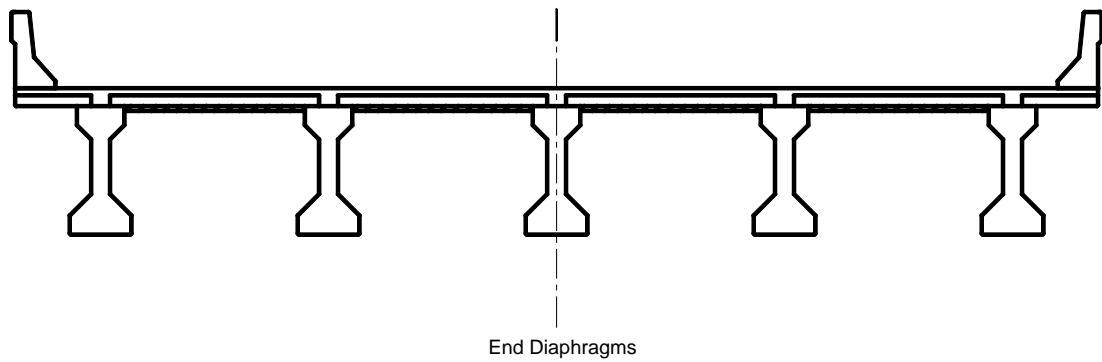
Diaphragm Layout – Willis Creek Bridge
